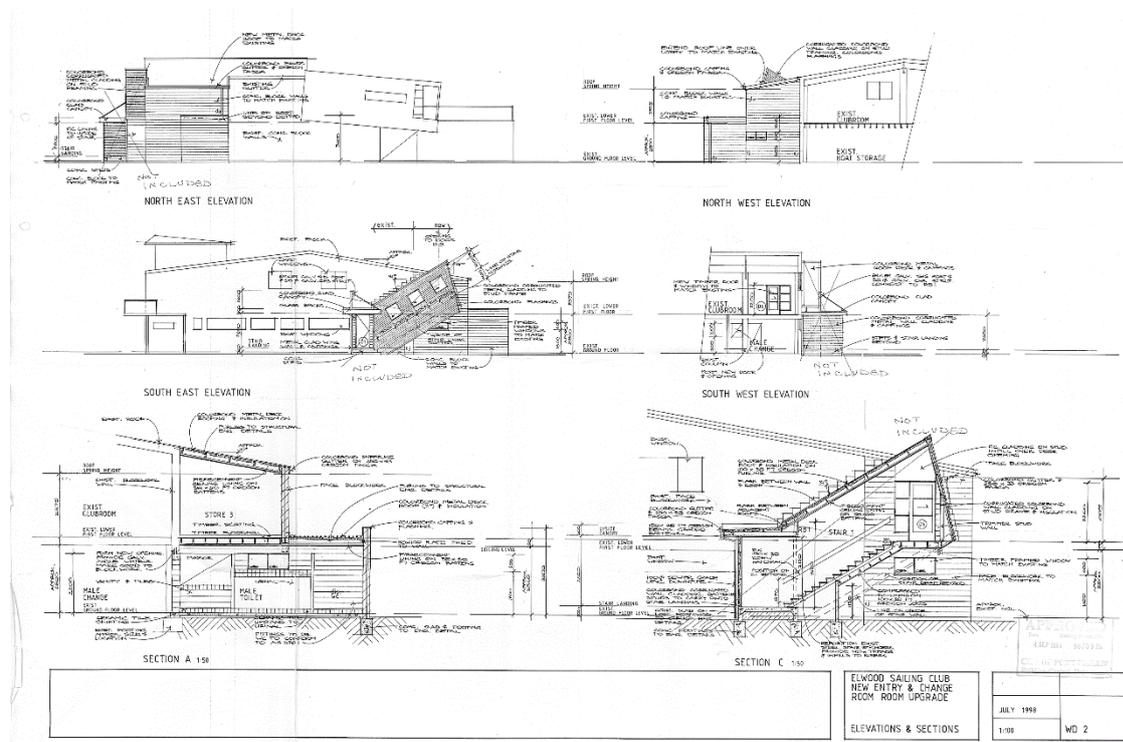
Elevations and sections for the new entry and change room upgrade, dated 1998 (Source: City of St Kilda)
